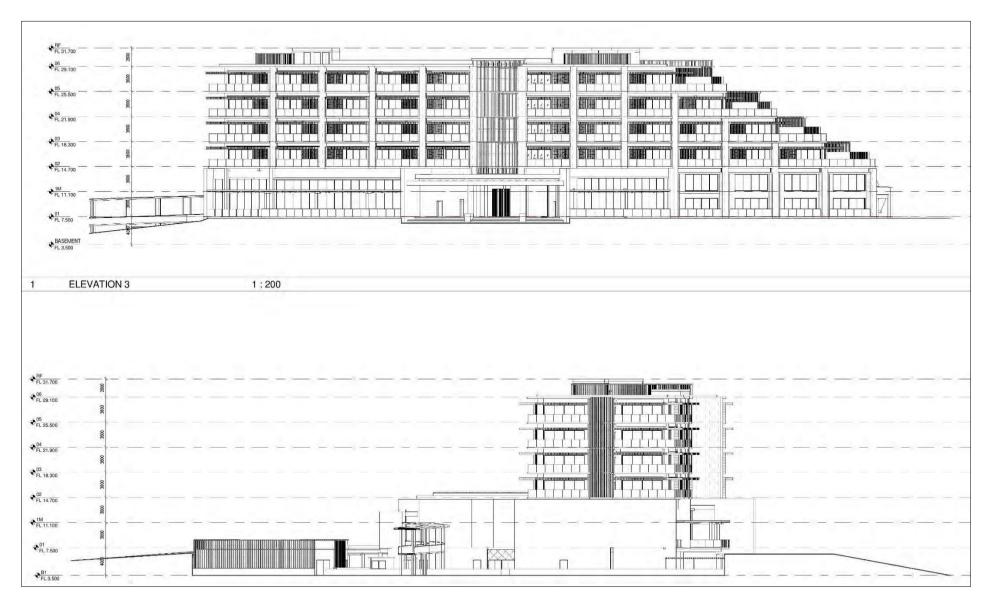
Front and Rear Elevation of Pun Hlaing Lodge Boutique Golf Hotel
